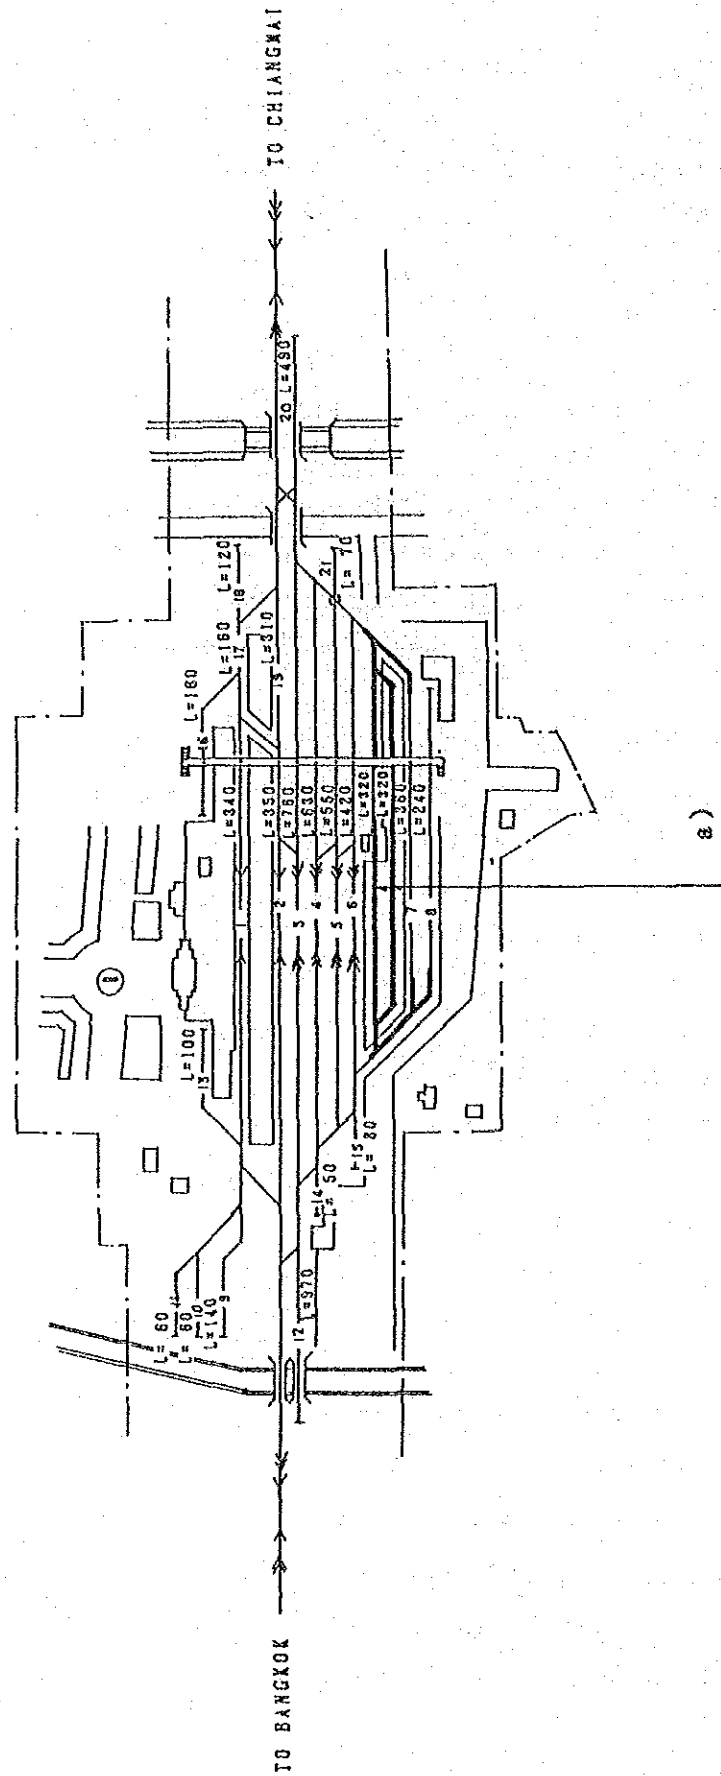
Future Track Layout at Phitsanulok Station
